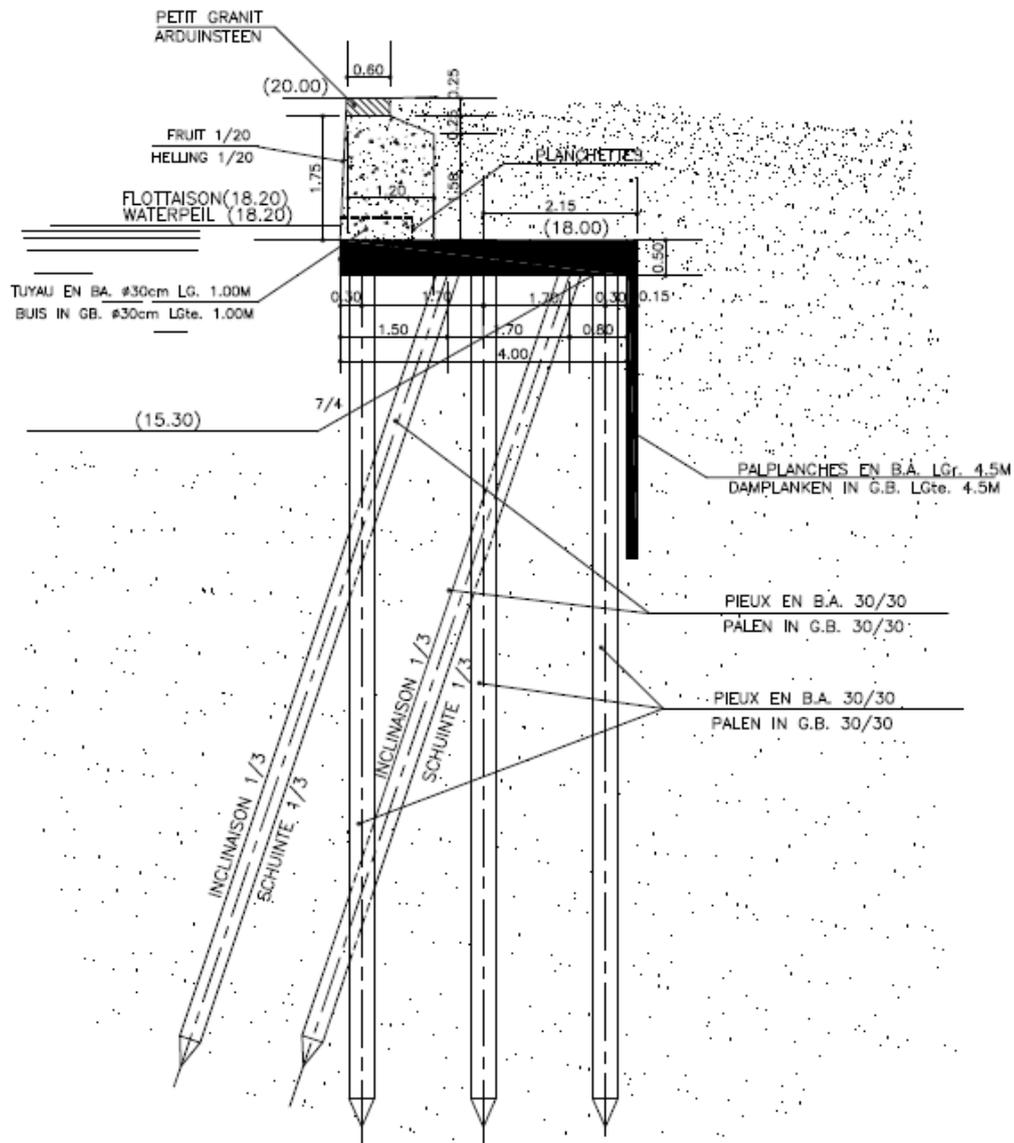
Cross section existing quay wall Biestebroek Dock (source: Port of Brussels)
